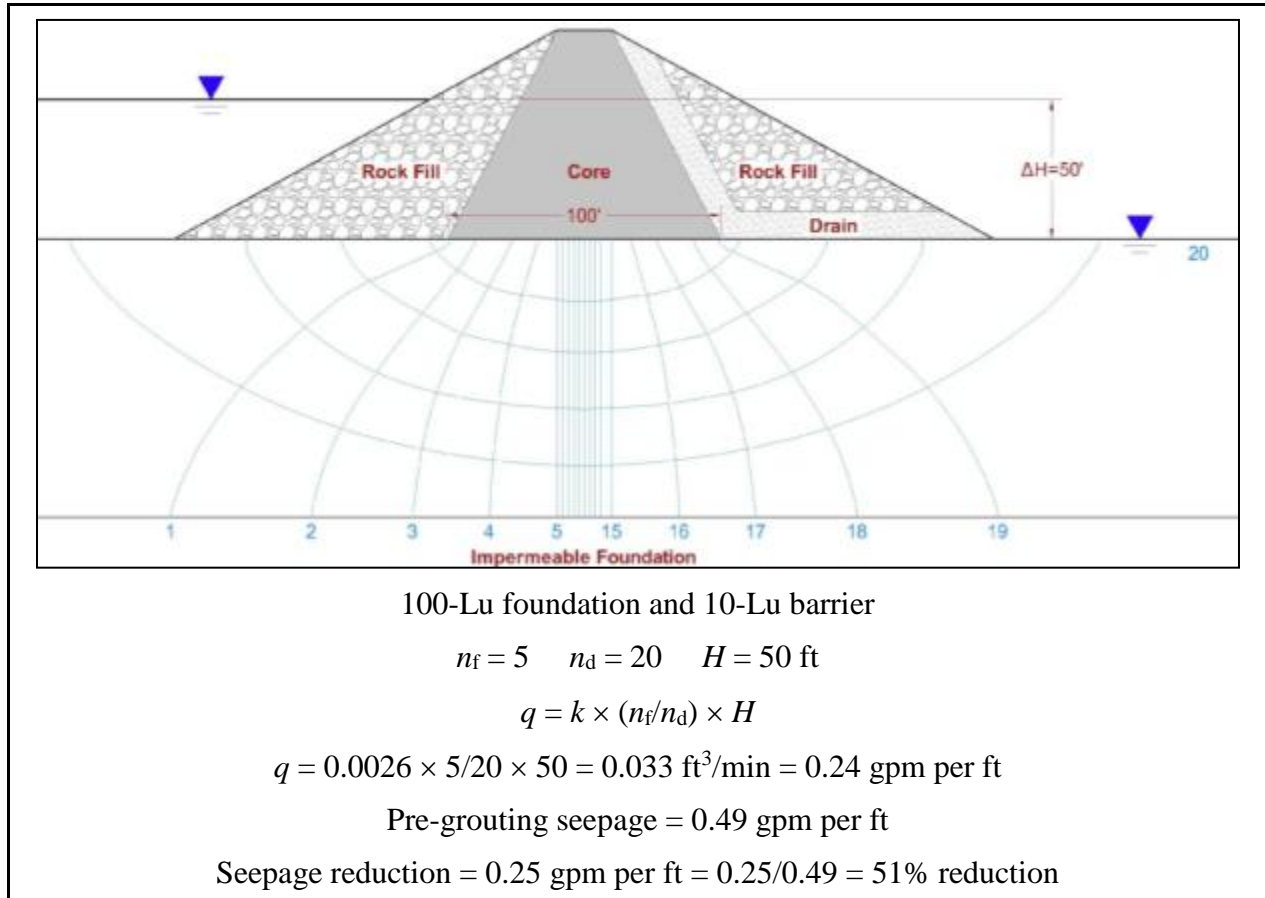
Flow net solution and flow calculations for grouting a barrier to 10 Lu within the 100-Lu foundation material.
